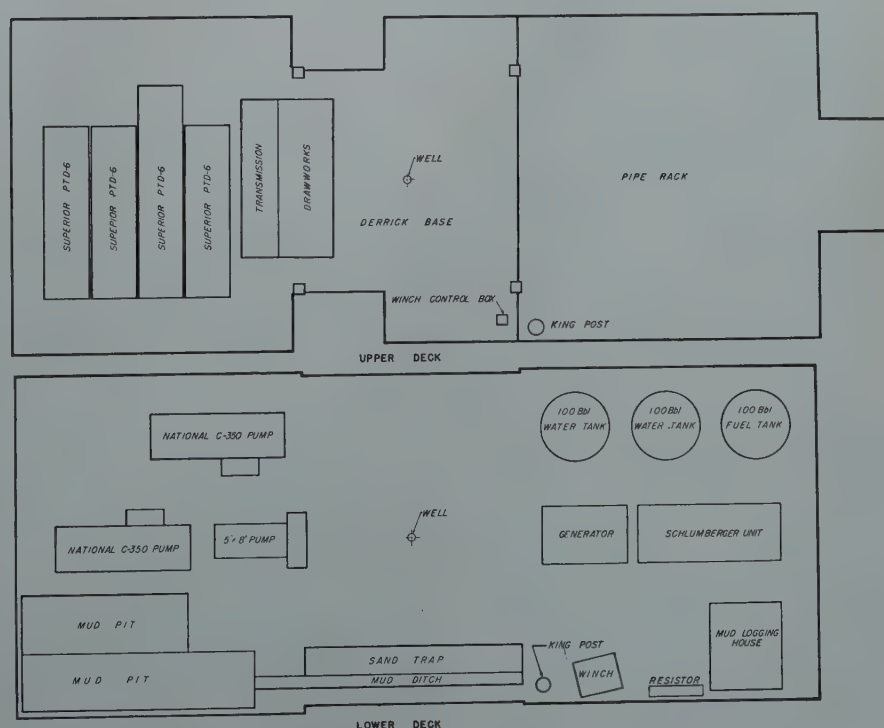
LAYOUT OF UPPER DECK AND LOWER DECKS OF DRILLING PLATFORM.
